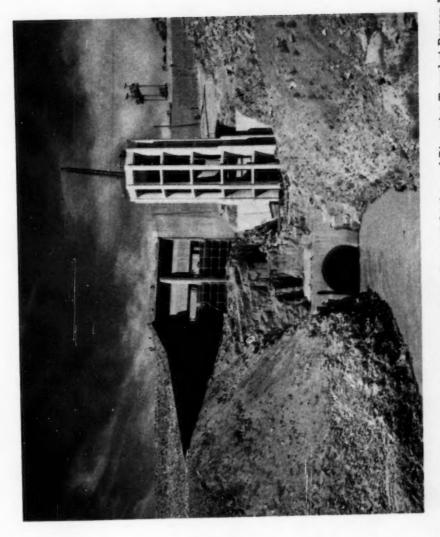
Looking Downstream at the Spillway Inlet, Penstock Intake, and Diversion Tunnel at Boysen Dam.
